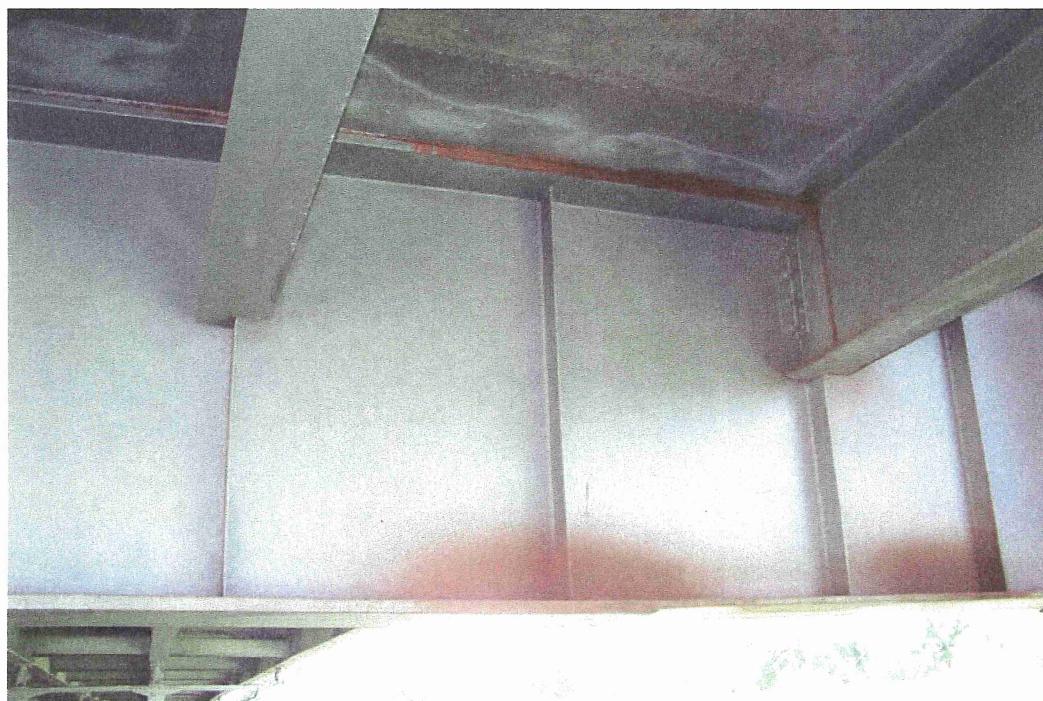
Typical pumping of deck above floorbeams in truss spans. Pumping of deck is most evident at either end of floorbeam and at mid span.
